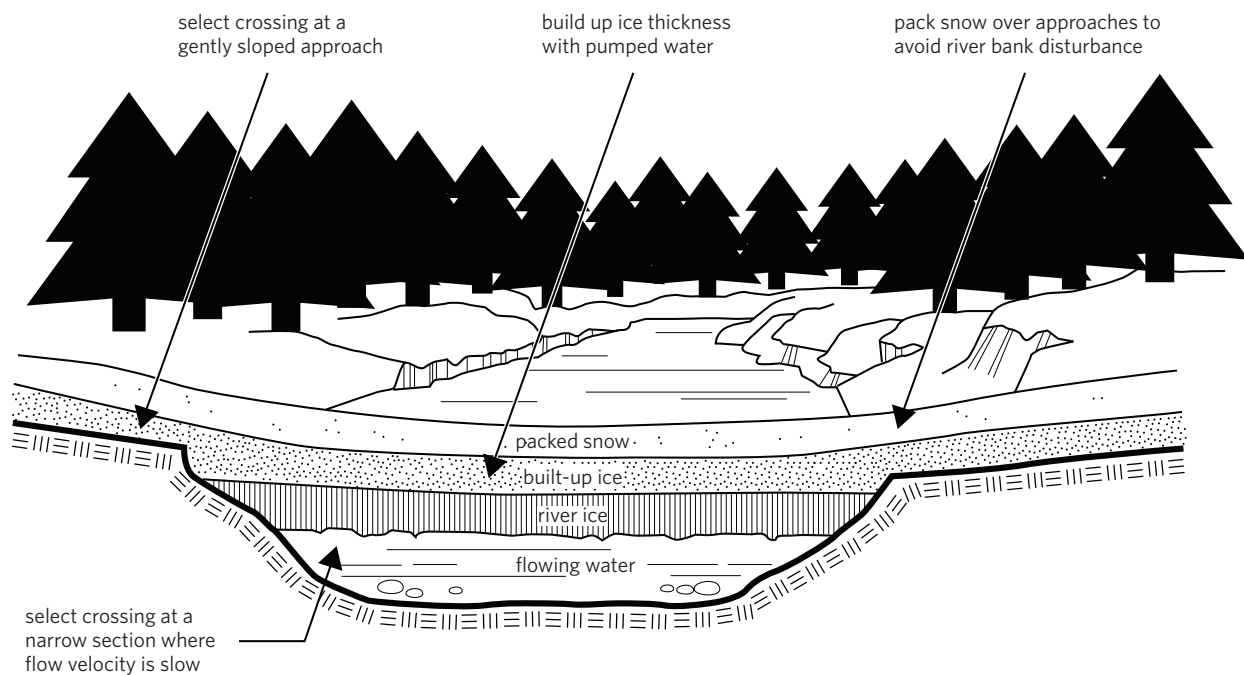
Typical ice bridge location and construction. (modified from Department of Transportation, Government of the Northwest Territories, 1993)
